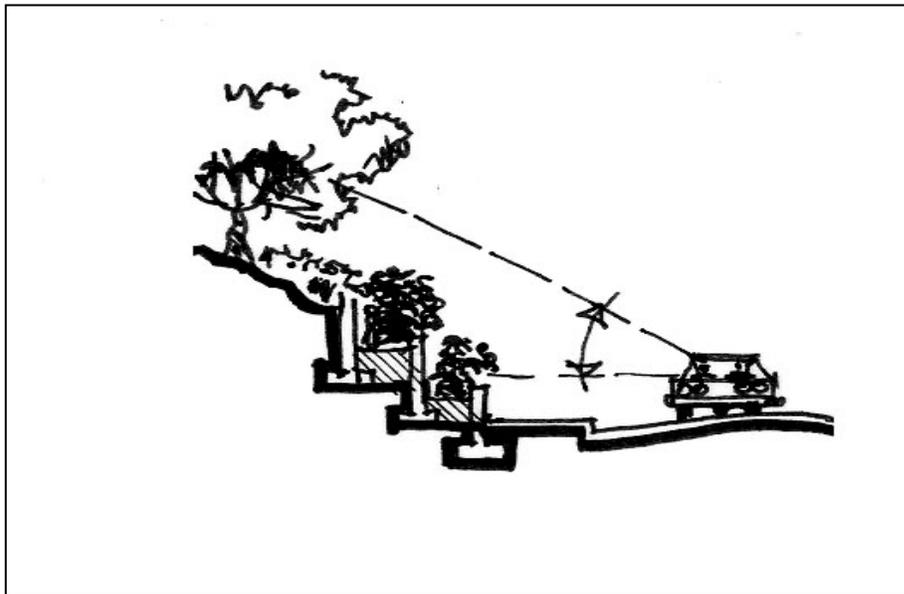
Example of containment works on hillsides. Source: Land use planning & Policy planning, development and assessment, 2009.
